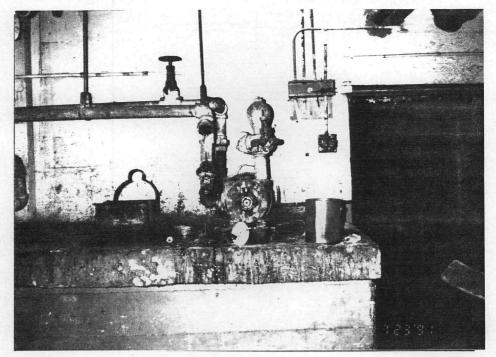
Orientation: North Location: Building 11 Date: 07/23/91
